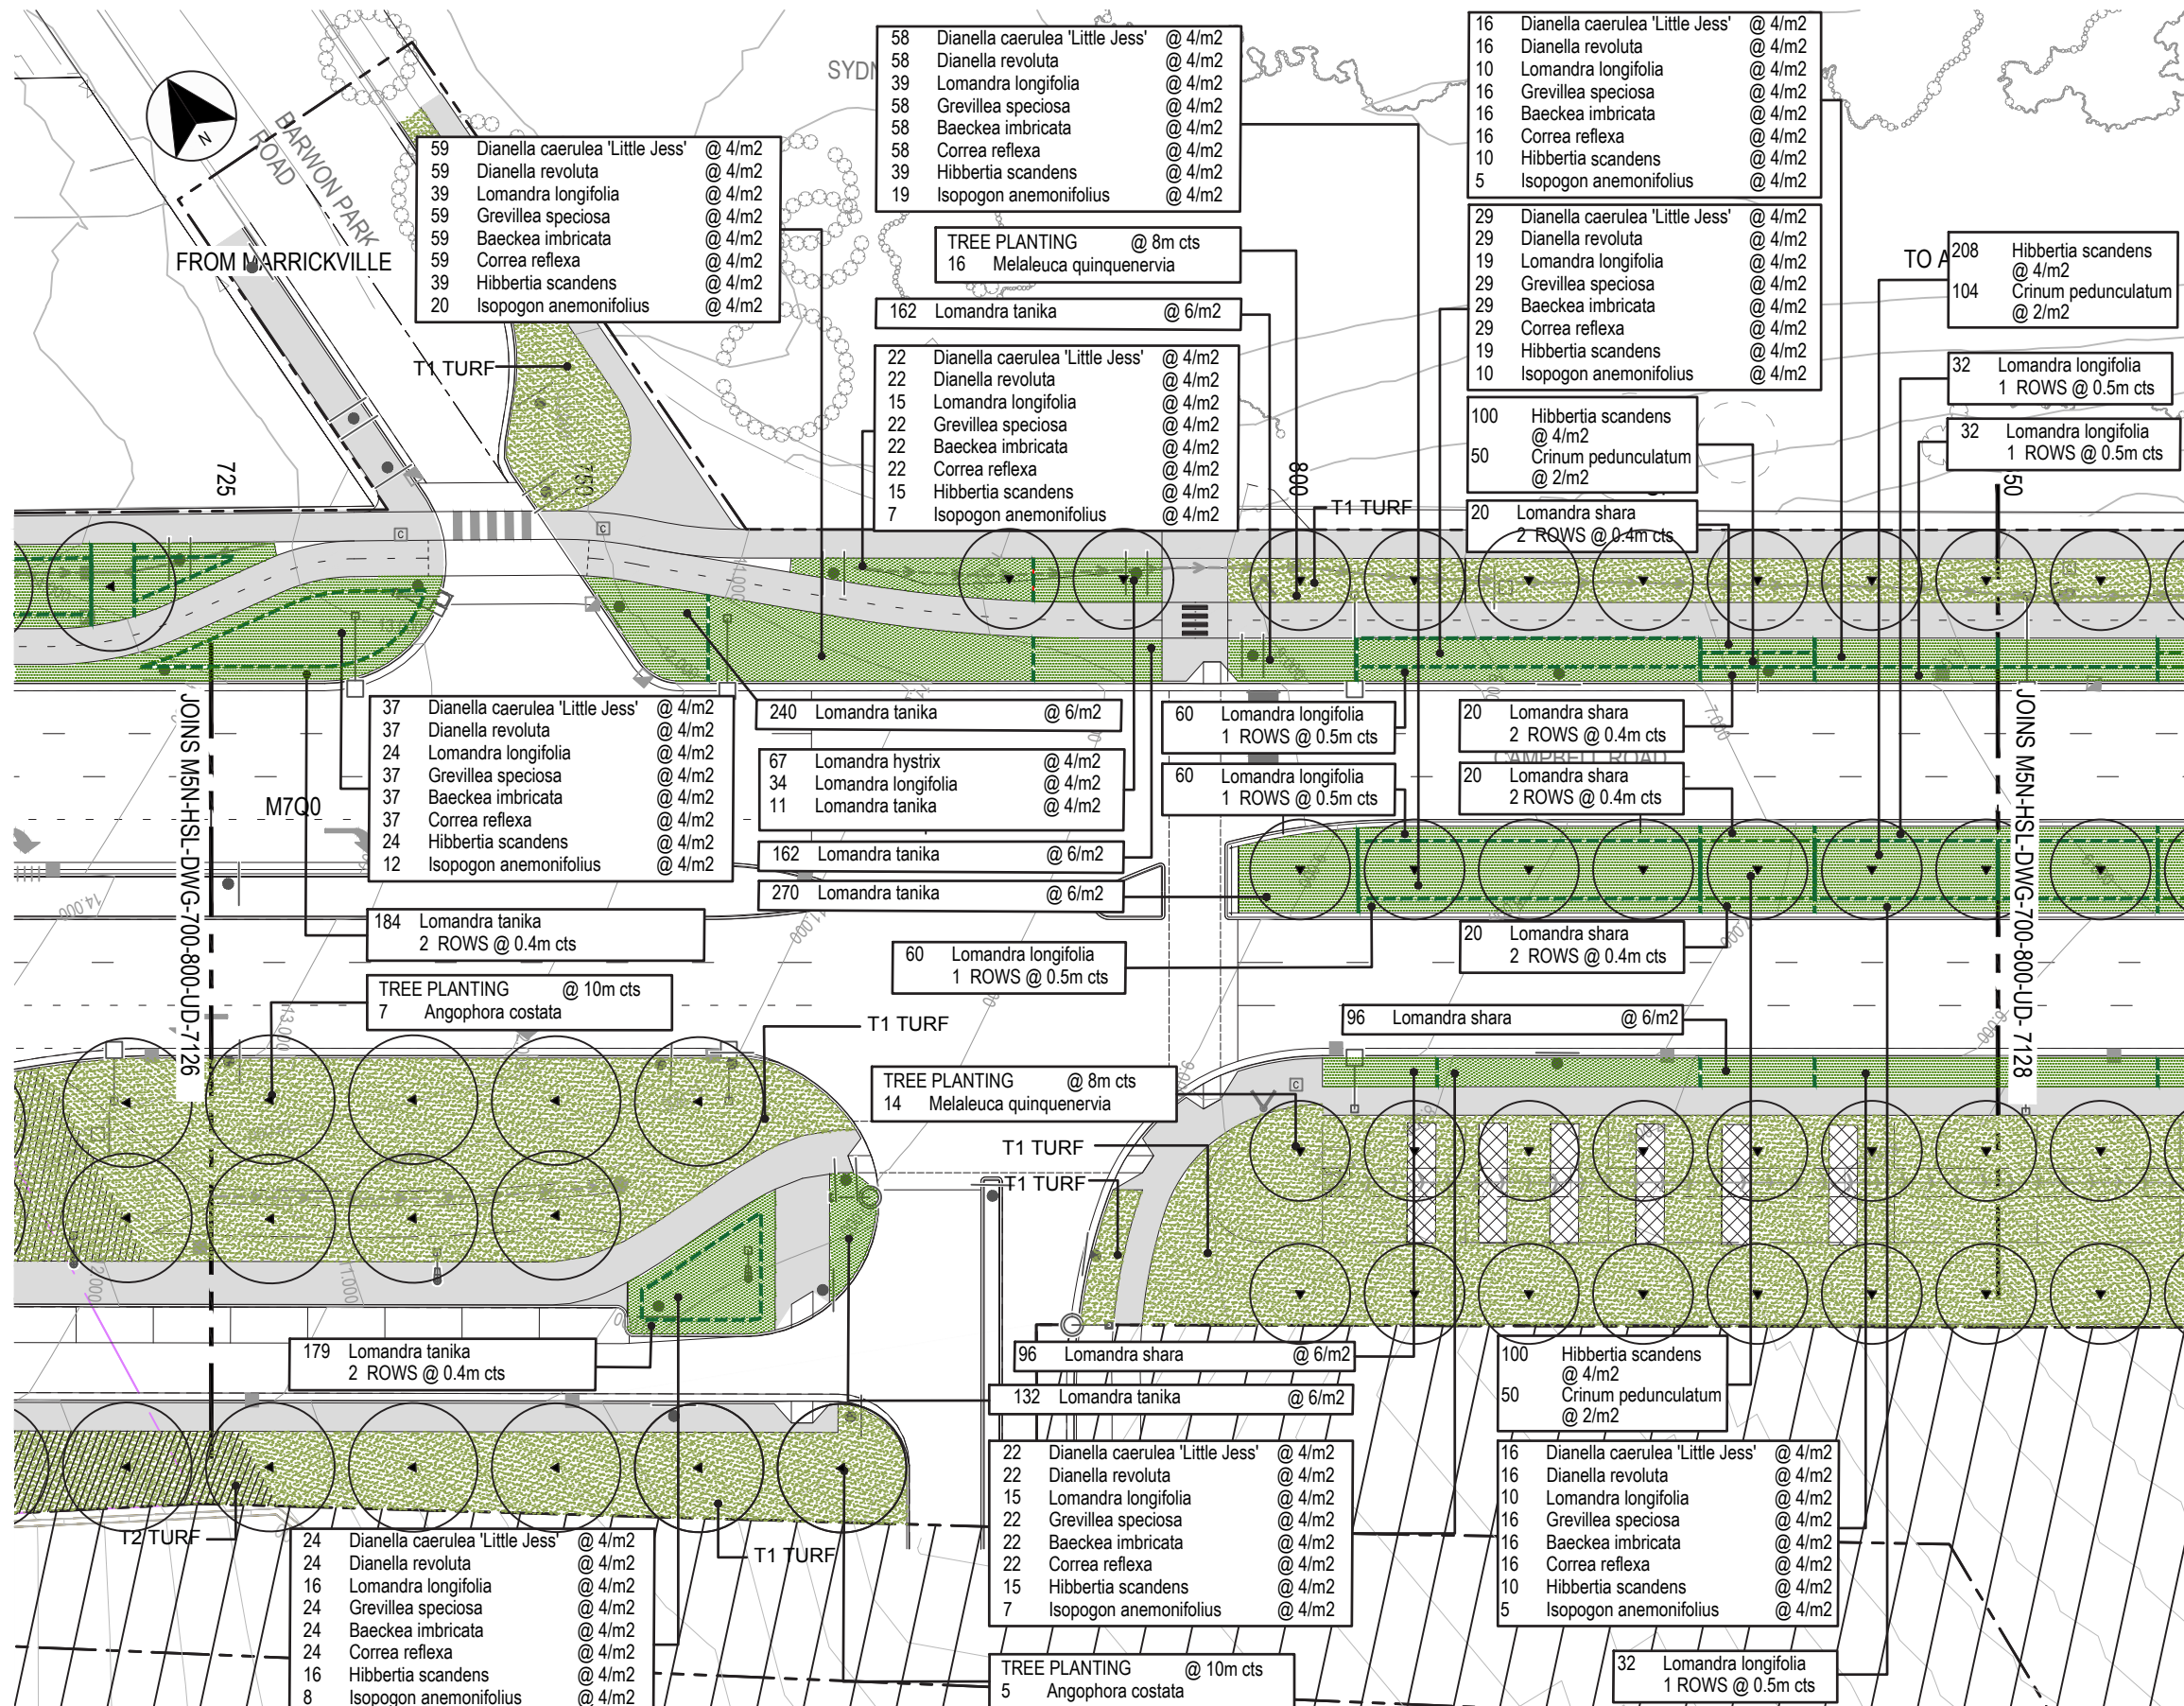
Campbell Street Green Link - Landscape Plans - Sheet 6 of 10
